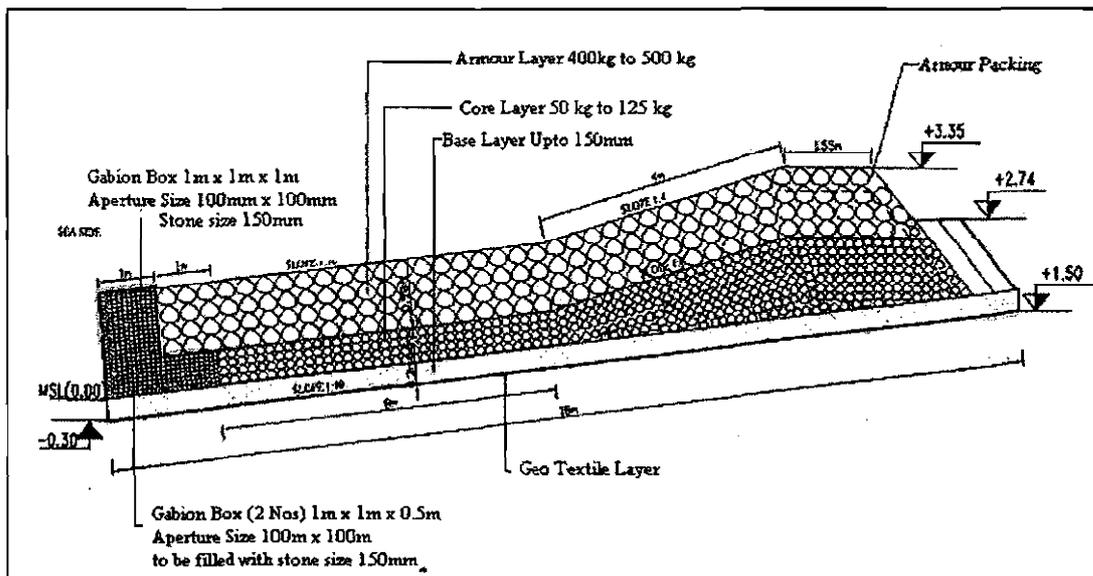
Typical Cross Section of Rubble Mound Sea wall
